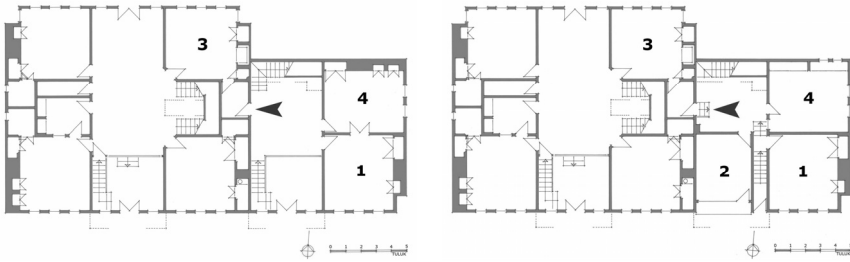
The first floor plans of the Yalçınlar Mansion from the first and the second phase of restitutions
